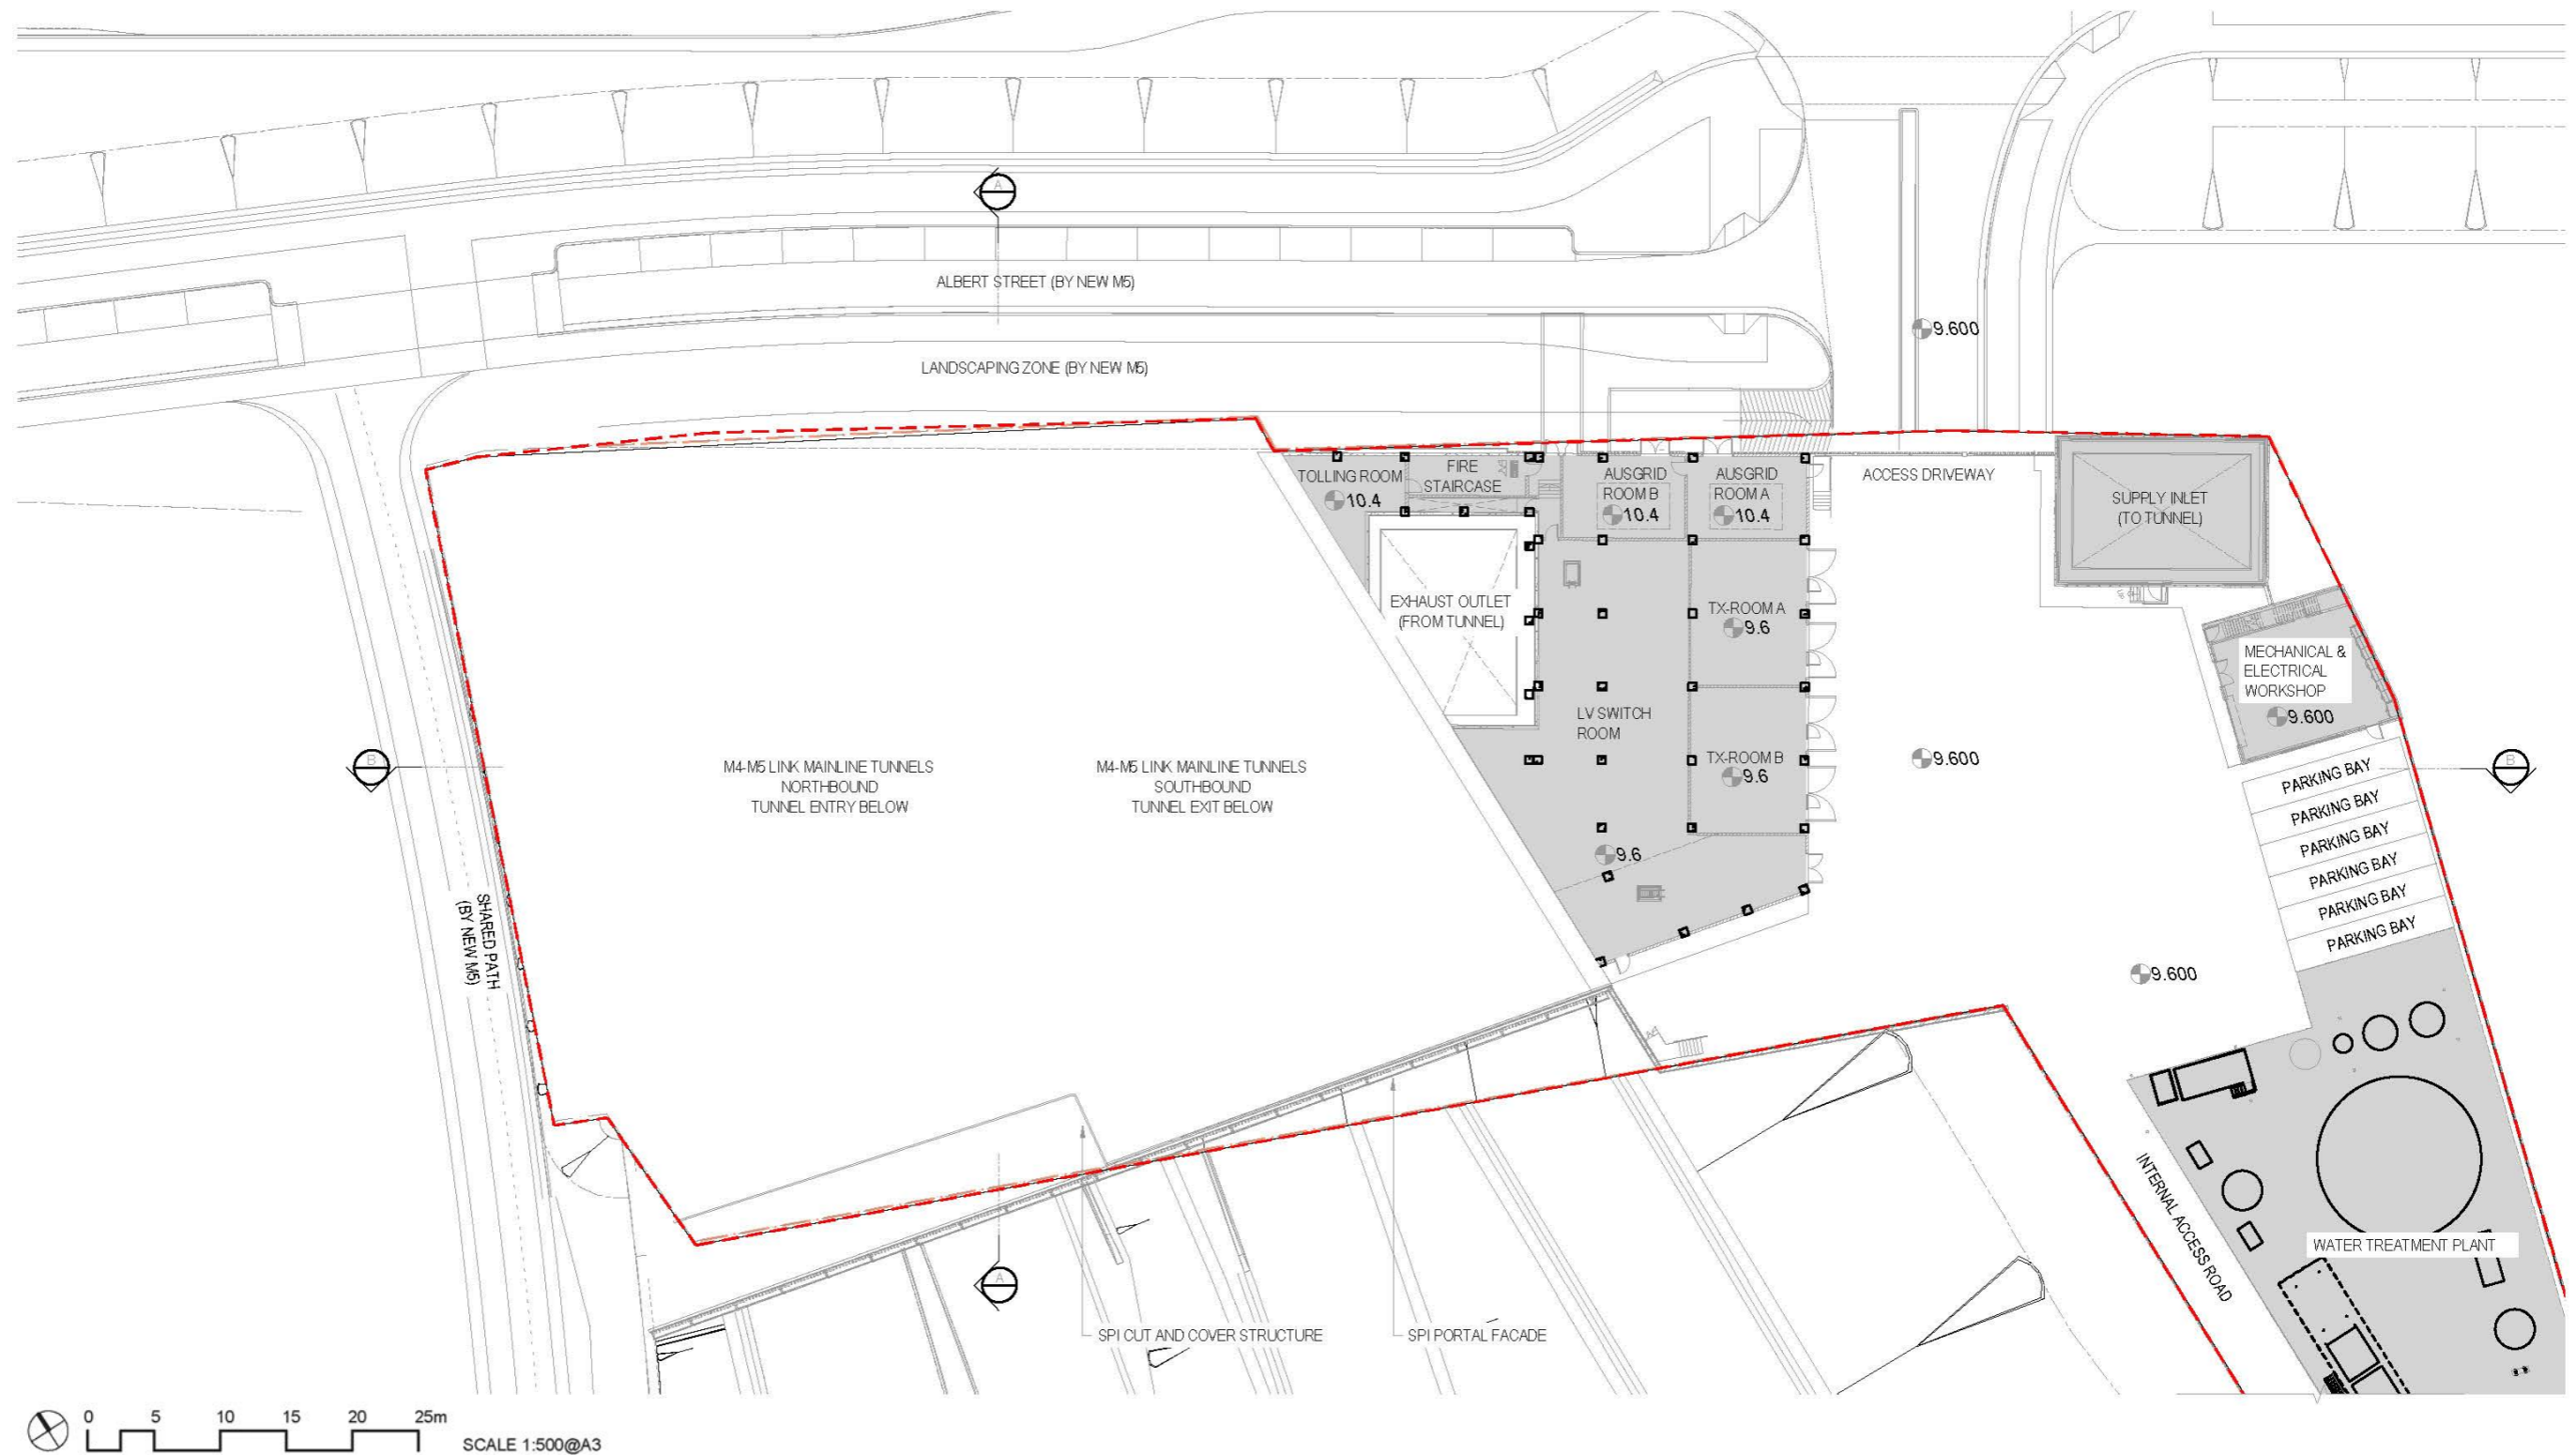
Campbell Road ventilation facility – ground floor plan
